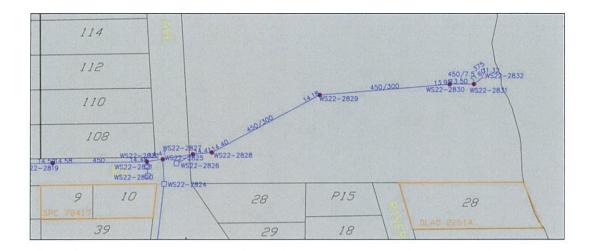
DRAINS section showing the stormwater pipe which discharges to the Spillway
